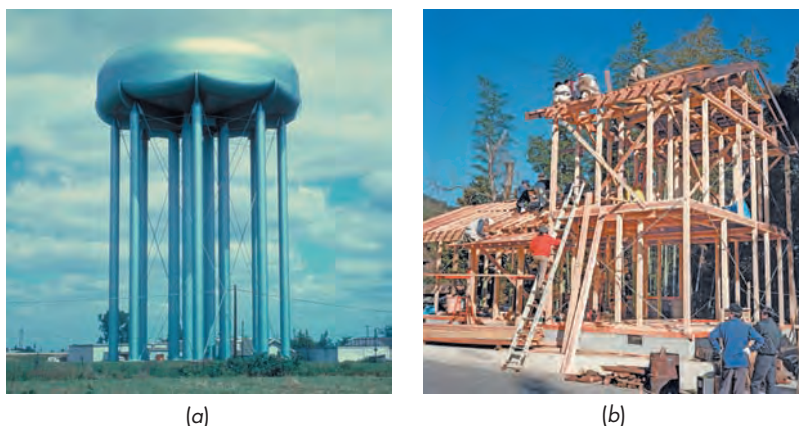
The water tank in (a) is supported by steel columns and the building under construction in (b) is framed with wood columns.
